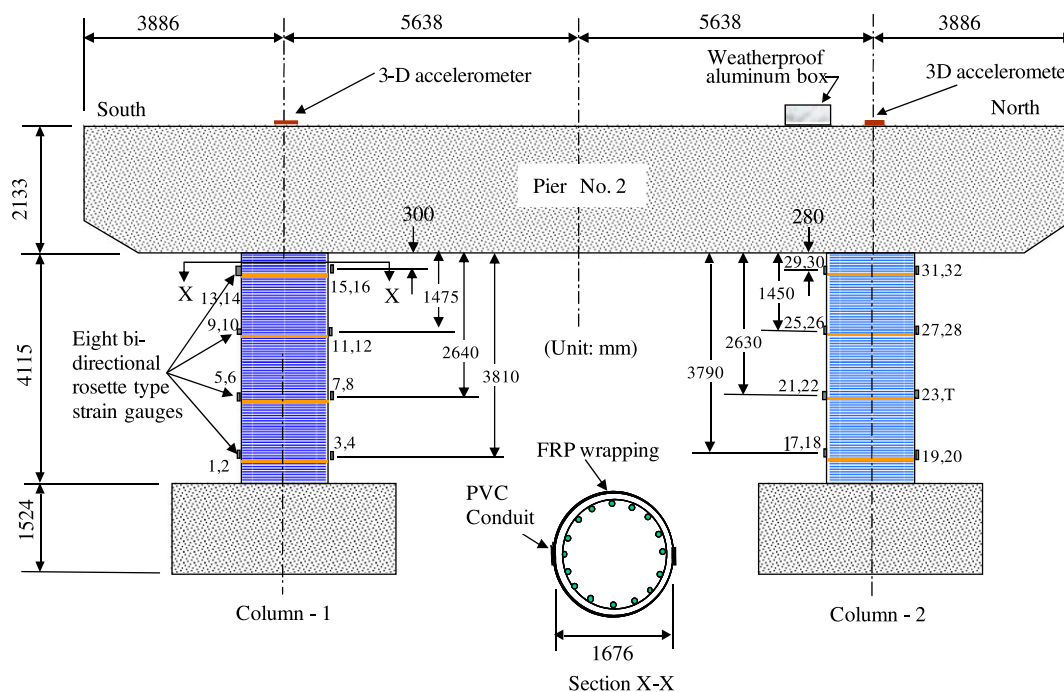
Elevation of Pier 2 (short columns) with sensor locations
